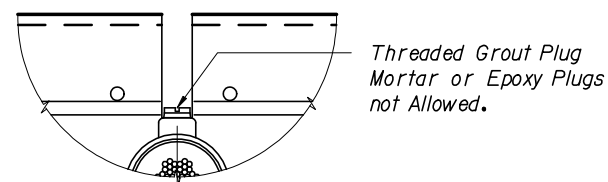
DETAIL B - FACE INSPECTED ANCHOR WITH GROUT INLET
